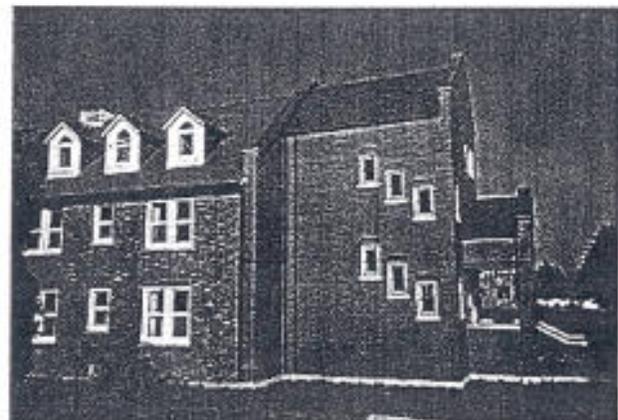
Building 26S: addition is incompatible with original structure
